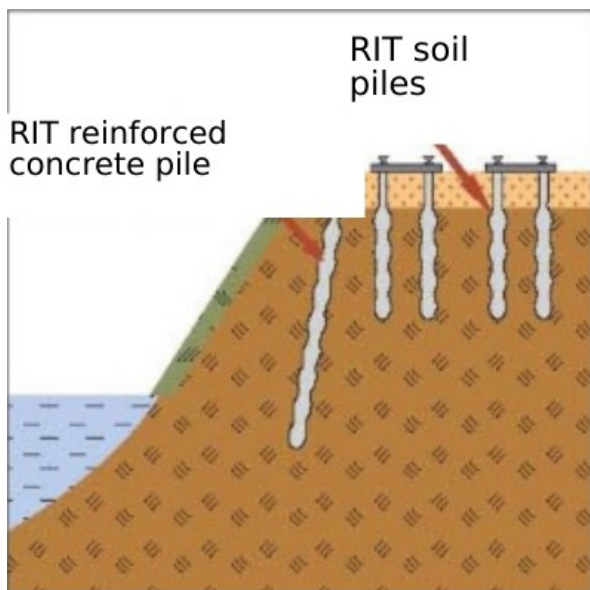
Railway embankment strengthening with RIT reinforced concrete piles and RIT soil piles.
